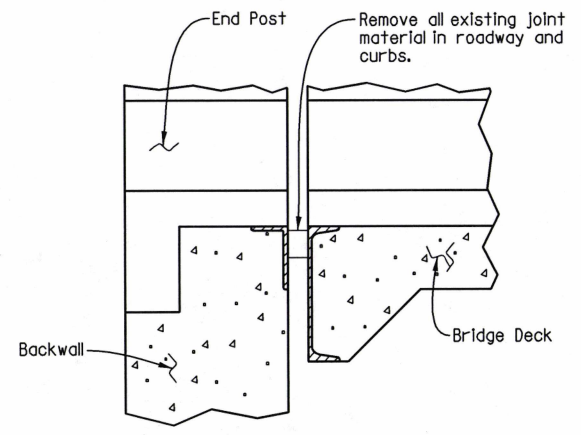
DETAILS OF LATEX MODIFIED CONCRETE OVERLAY
